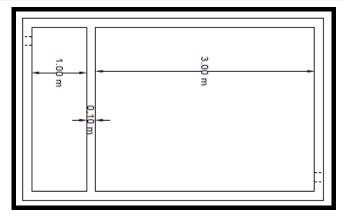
Plan view of sedimentation basin constructed in Pampoyo, Bolivia
